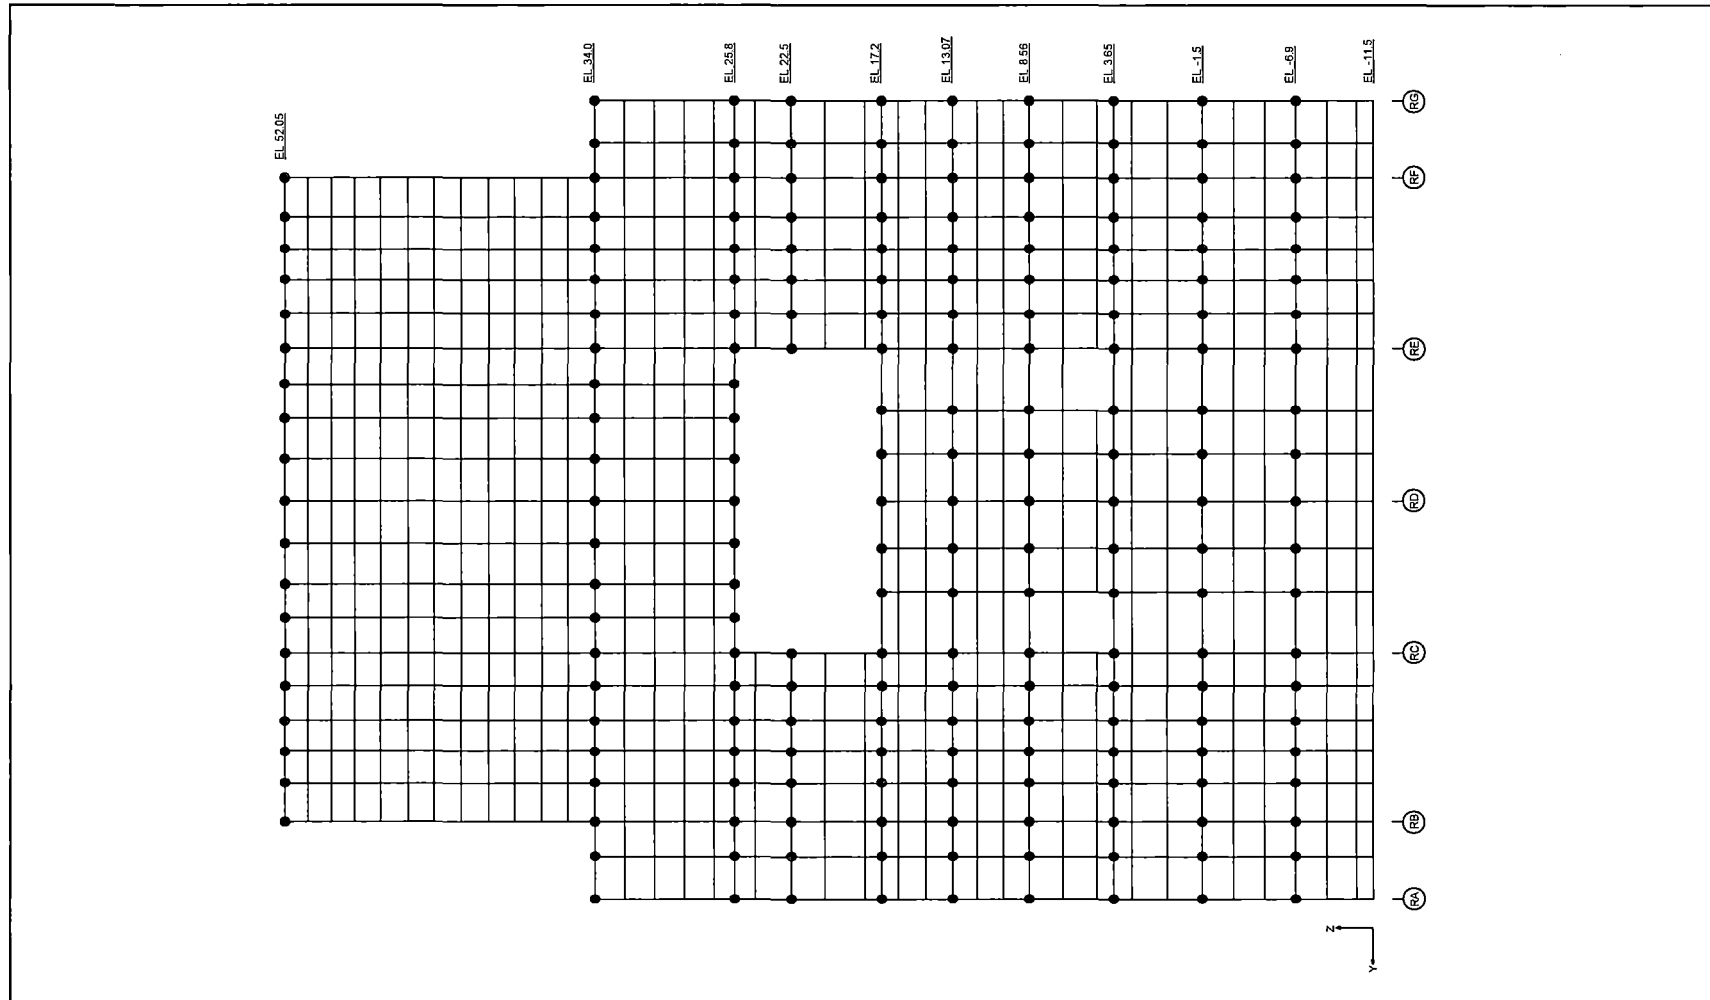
Application of Overturning Moments to the External Wall on R1 Column Line
